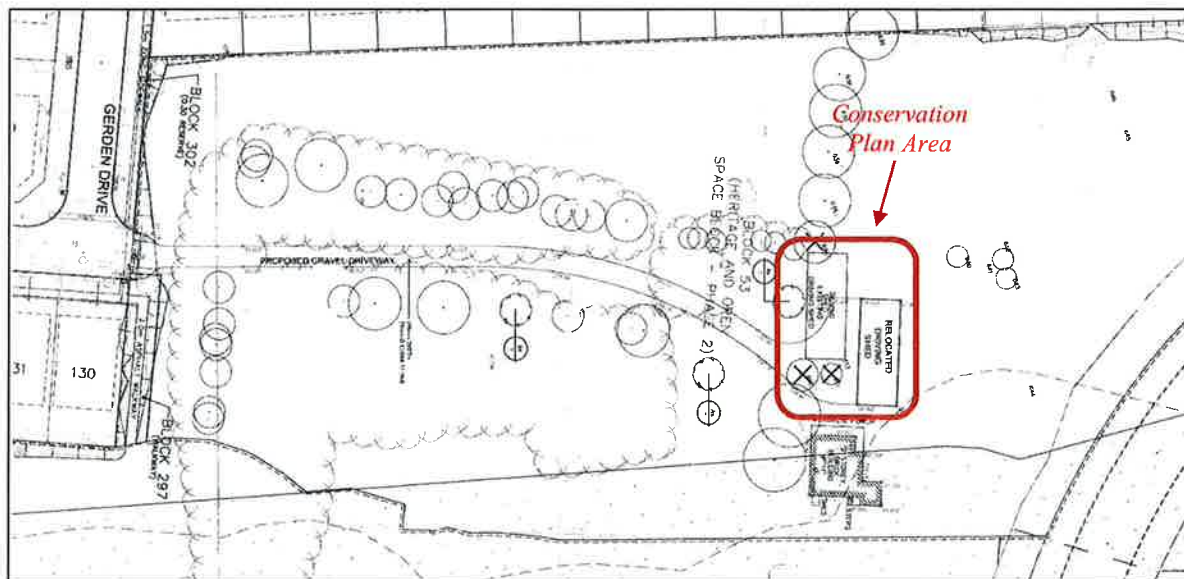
Conservation/Replication Plan Context Source: Part of Heritage House Landscape Plan prepared by the mbtw group, dated May 30, 2019.
